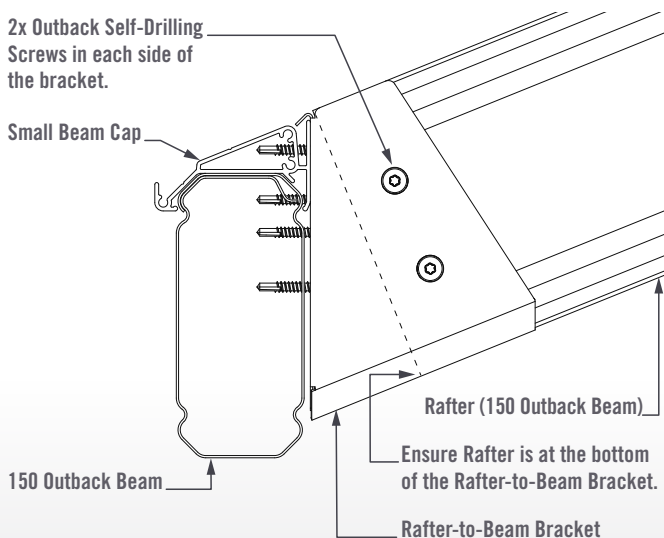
SMALL BEAM CAP - 150 SIDE BEAM - 150 RAFTER
